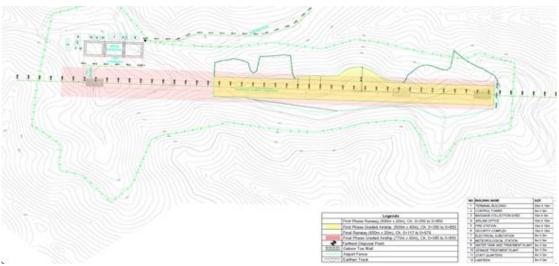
Arghakhanchi Airport Exisiting Plan
